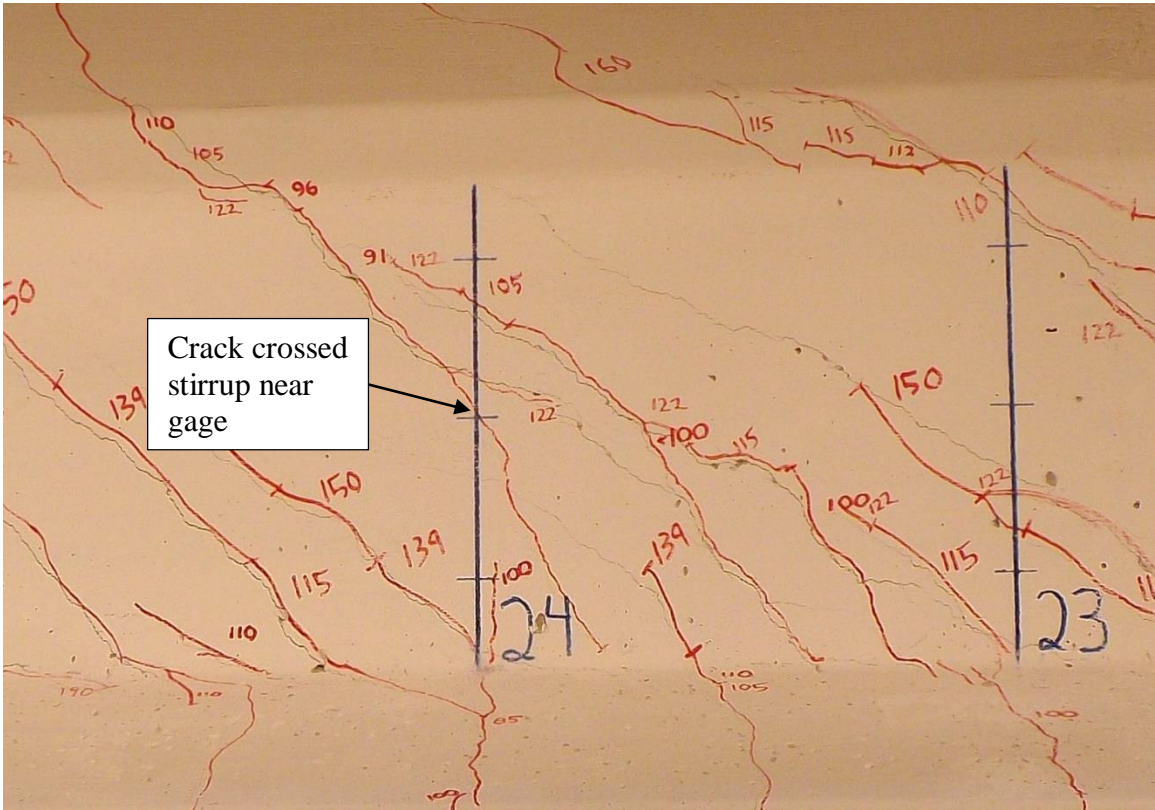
Shear crack crossing short leg of stirrup 24 following 36M_18F test (offset relative to opposite side of web).
